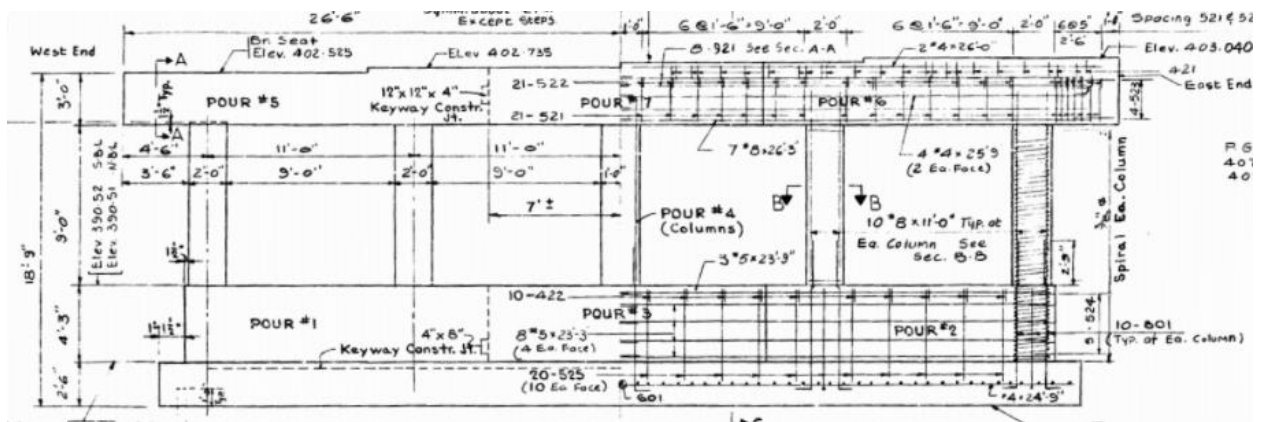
Transverse Elevation of Interior Pier (NBI 14280) (1967)
